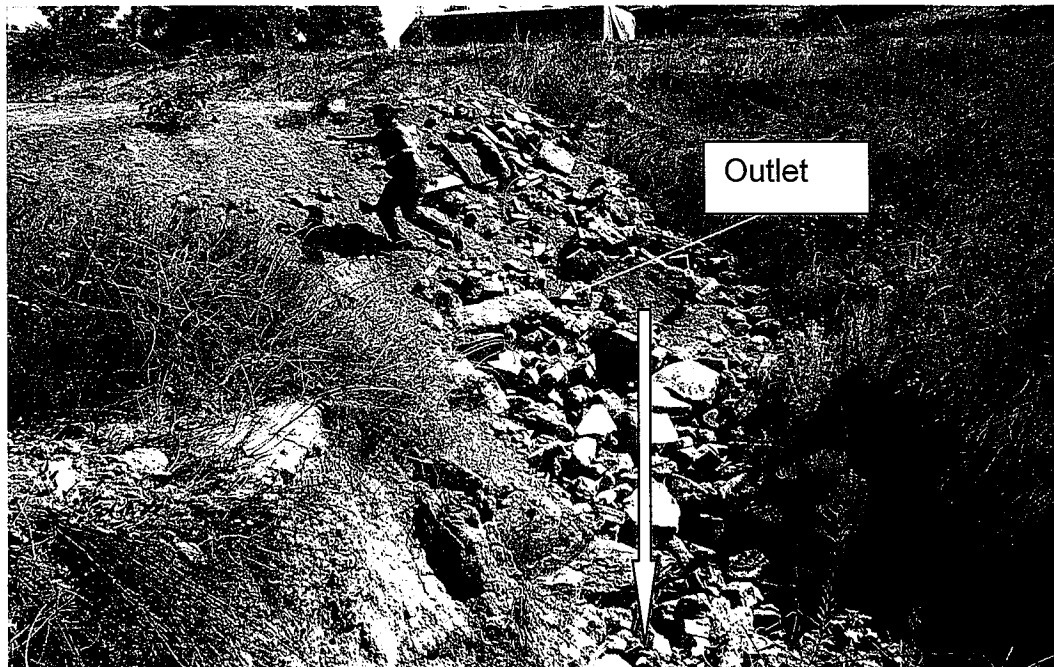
Insert shows culvert pipe's outlet. This natural waterway is a tributary to Santa Gertrudis Creek. Complainant states that the creek bed was at the level of the outlet pipe before the upstream Roripaugh basin was constructed.
